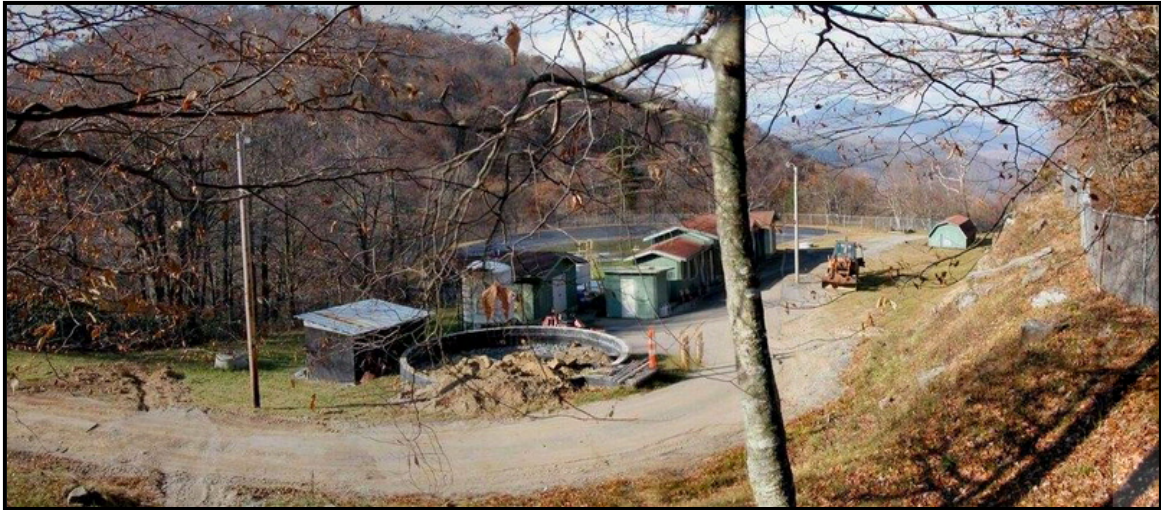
Photograph of Existing Mount Pisgah Wastewater Treatment Plant
